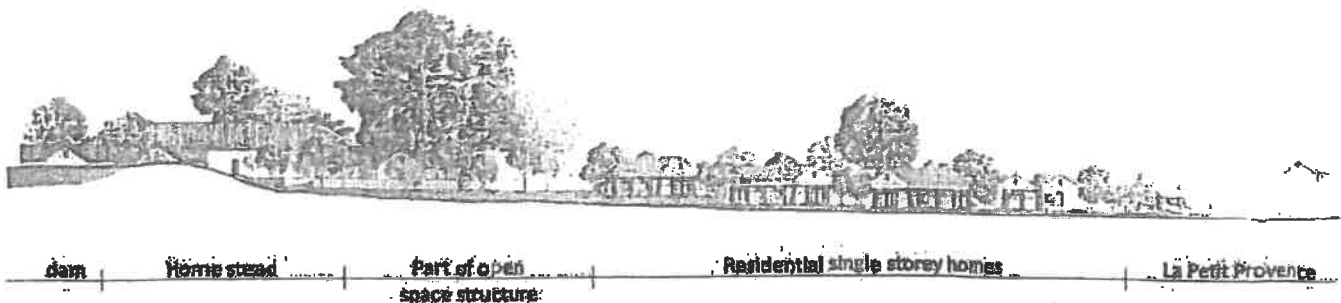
Indicative sectional elevation of new development alongside the new "werf" and homestead [Urban Concepts]
